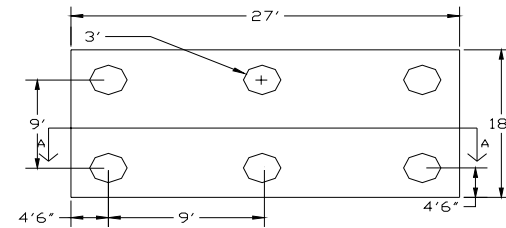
NCHRP Foundation Design Details for Expansion Bent
